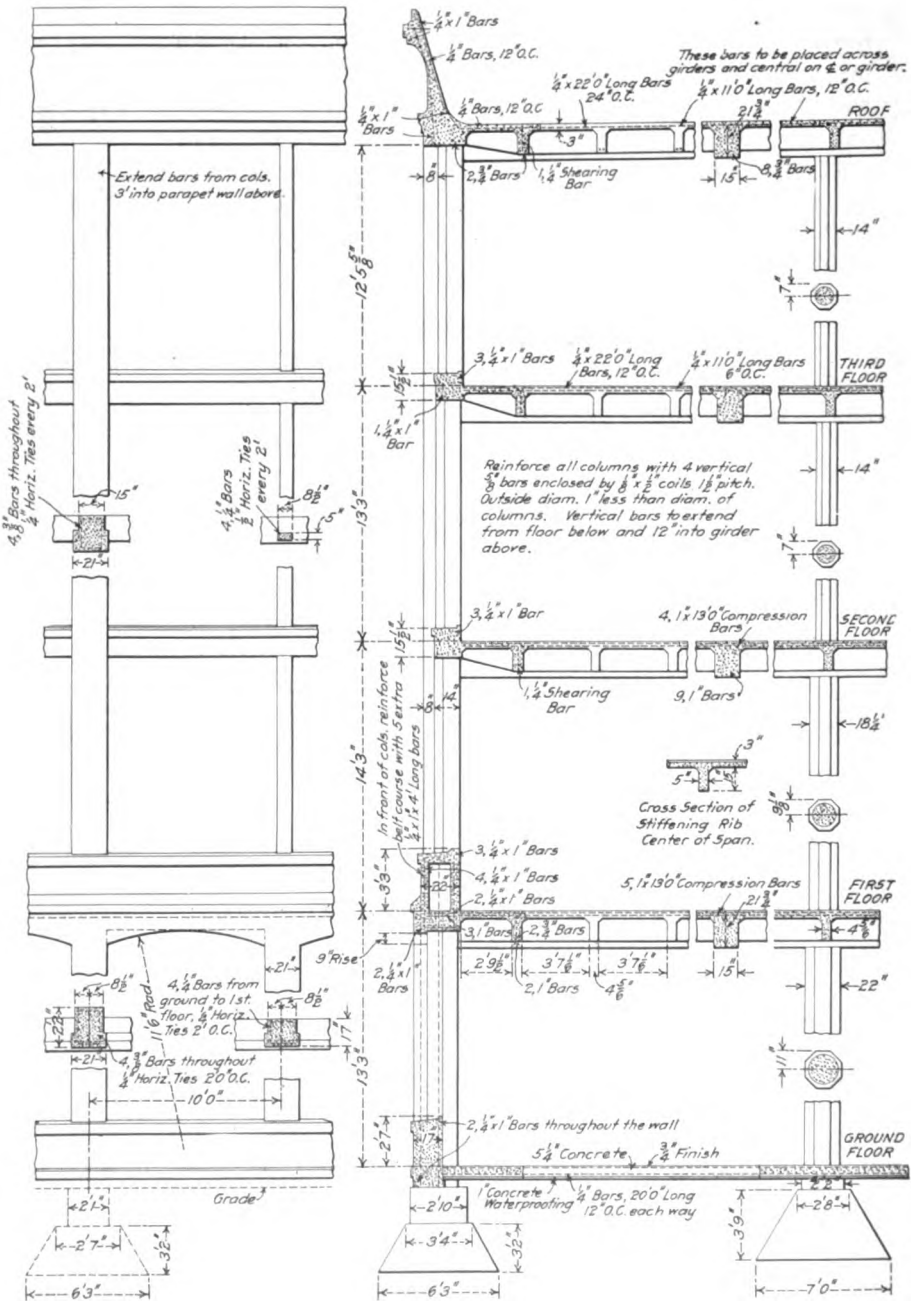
TYPICAL PARTIAL CROSS-SECTION OF A MAIN BUILDING
